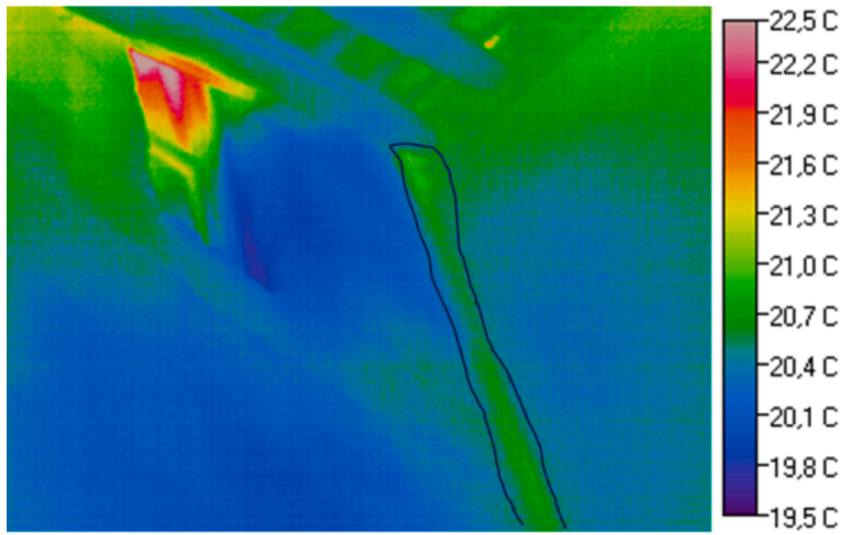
Air infiltration between walls, signal of a thermal bridge.
